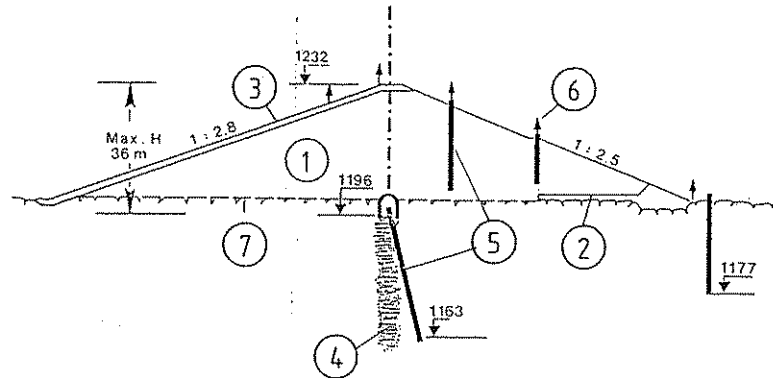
Typical section of a homogeneous dam. Example Shen river dam, Nigeria 1979.
